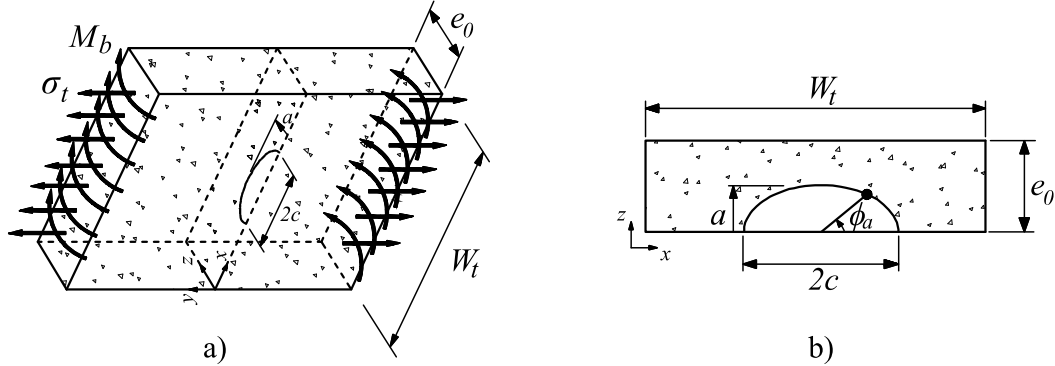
Geometry of a concrete plate section with a semi-elliptic crack and cross-section detail (Adapted from Biglari and coauthors [83]).
